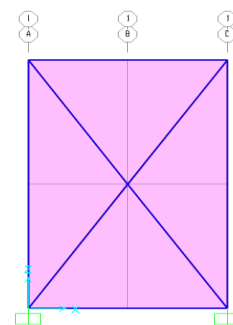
Elevation of diagonal framed Dhajji-Dewari wall.
